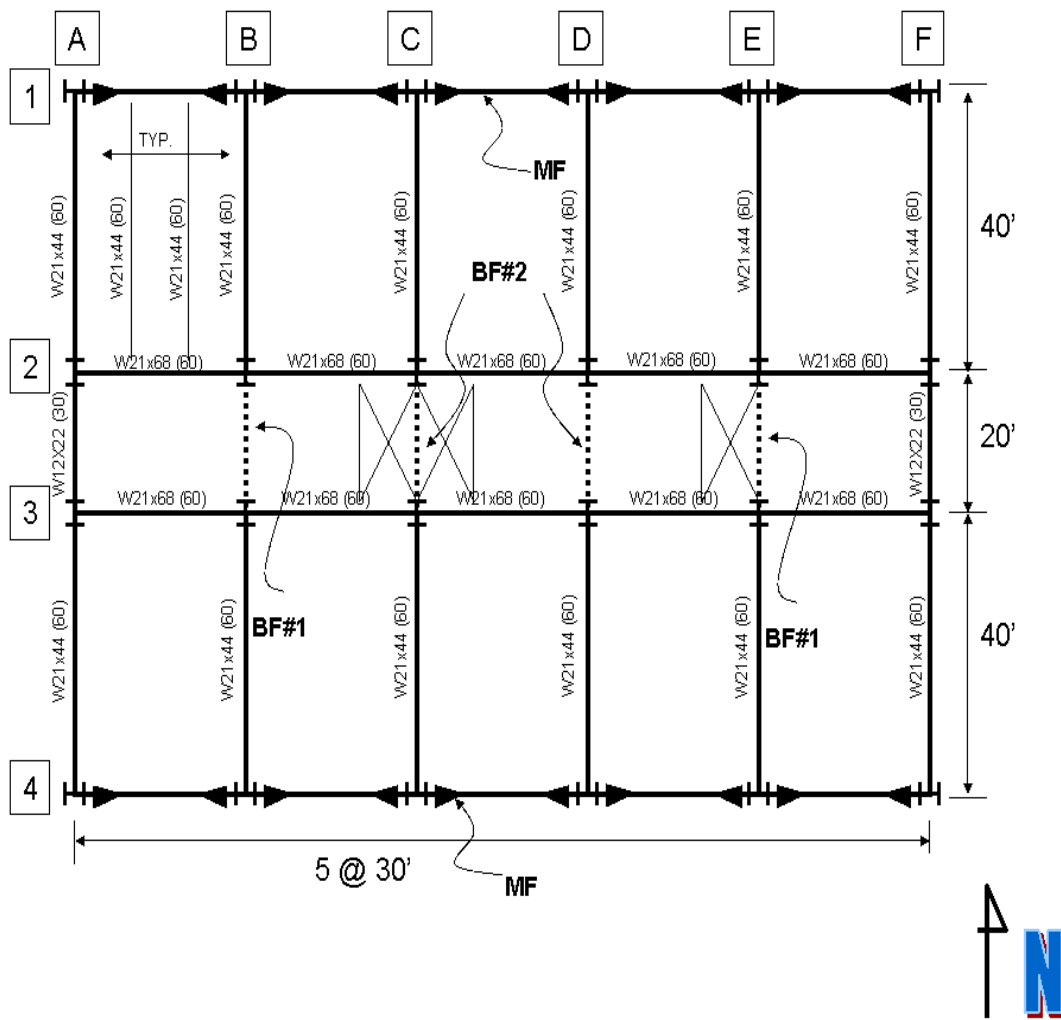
Typical Floor Plan (Roof Plan is Similar)
